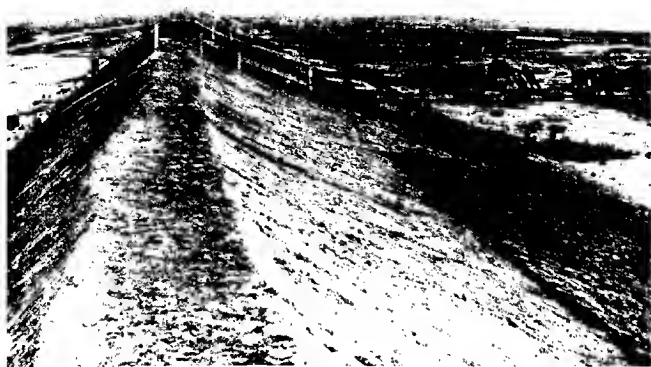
New Sea Bank: Wainfleet South. View looking north.
